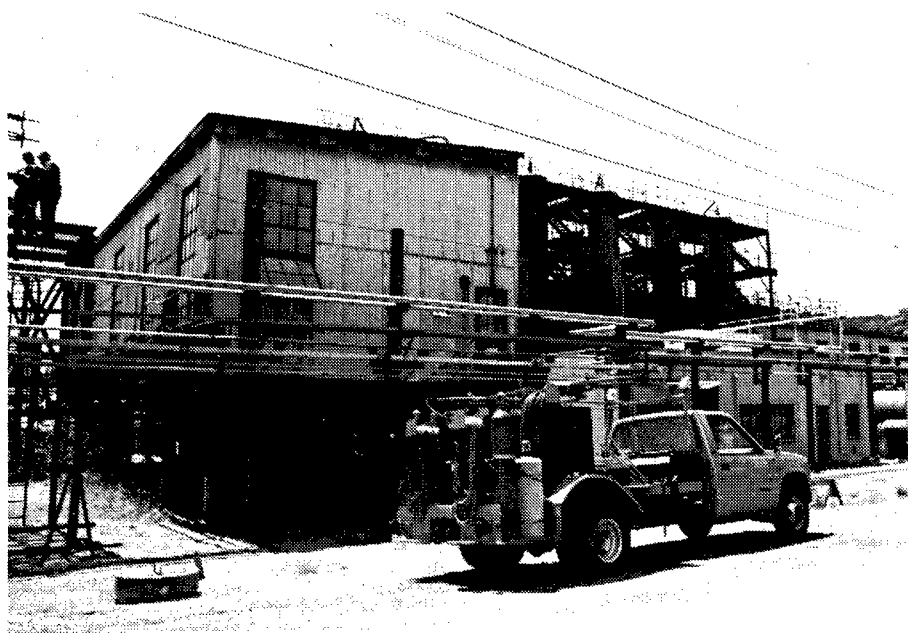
Building 302: Acid Manufacturing Plant, Ammonia Oxidation Building.
